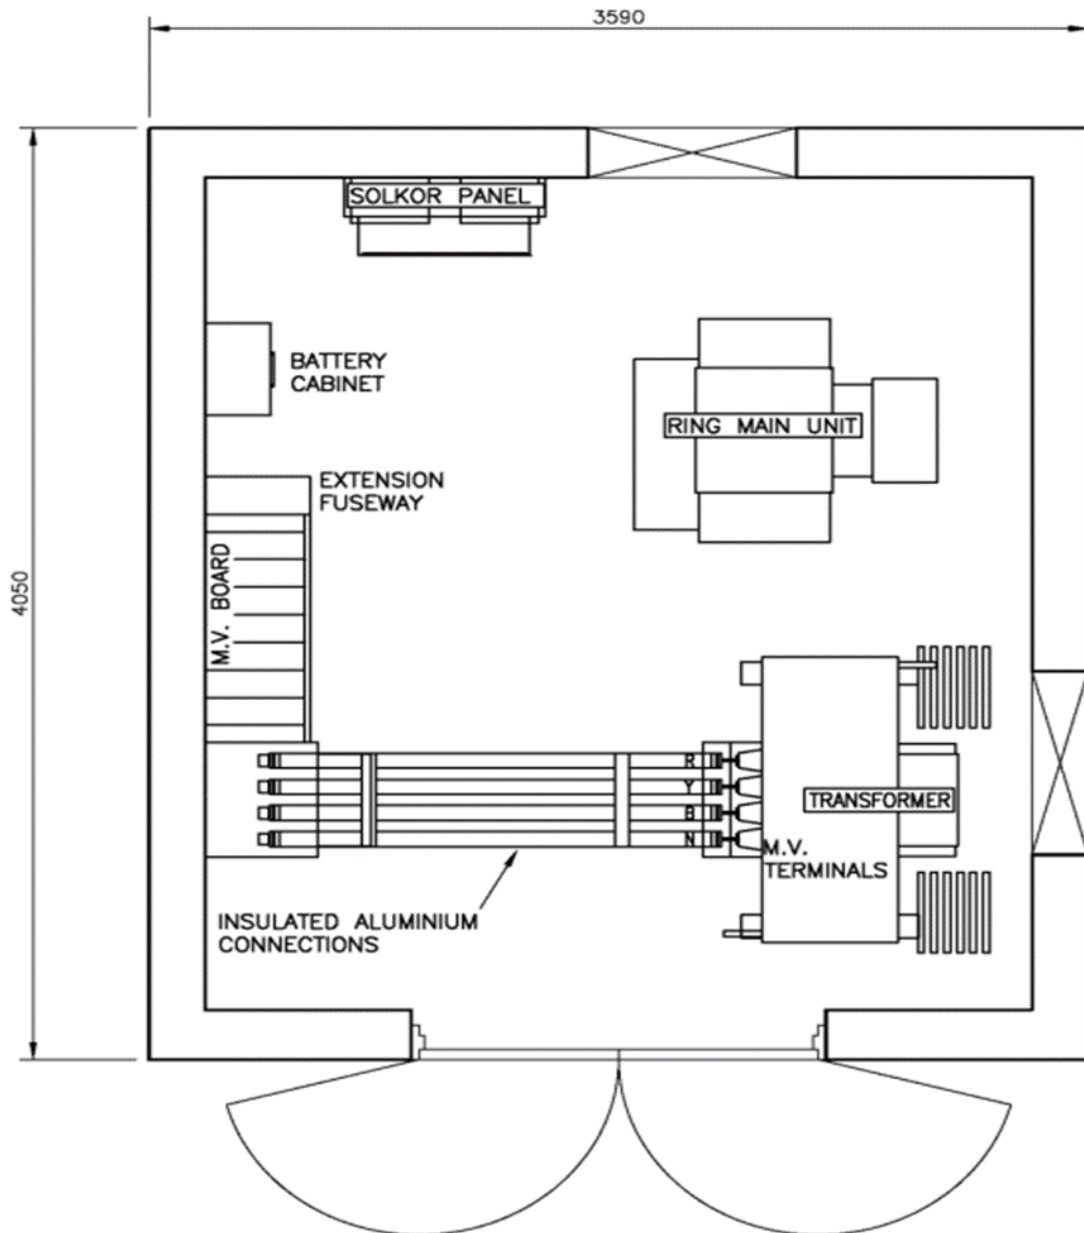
X-type secondary substation layout [2] (\*All units are in mm)
